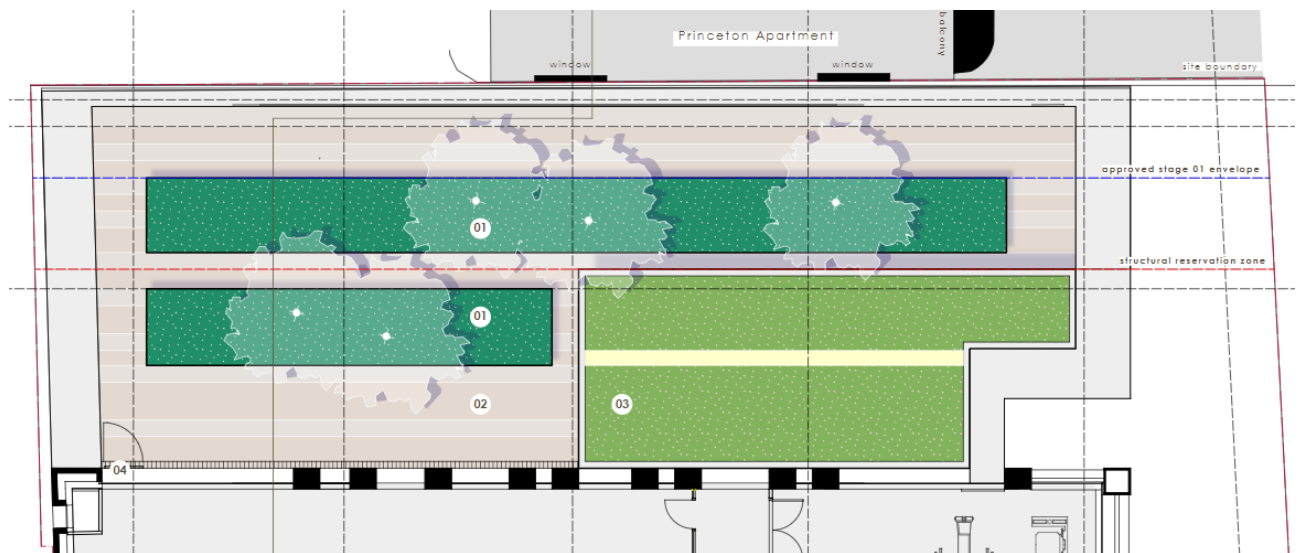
is a plan of the originally proposed accessible courtyard and Figure 2 shows the redesigned in-accessible landscape zone.
